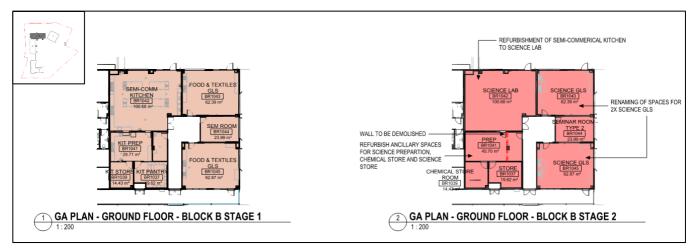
EXISTING AND PROPOSED BLOCK B GROUND FLOOR
